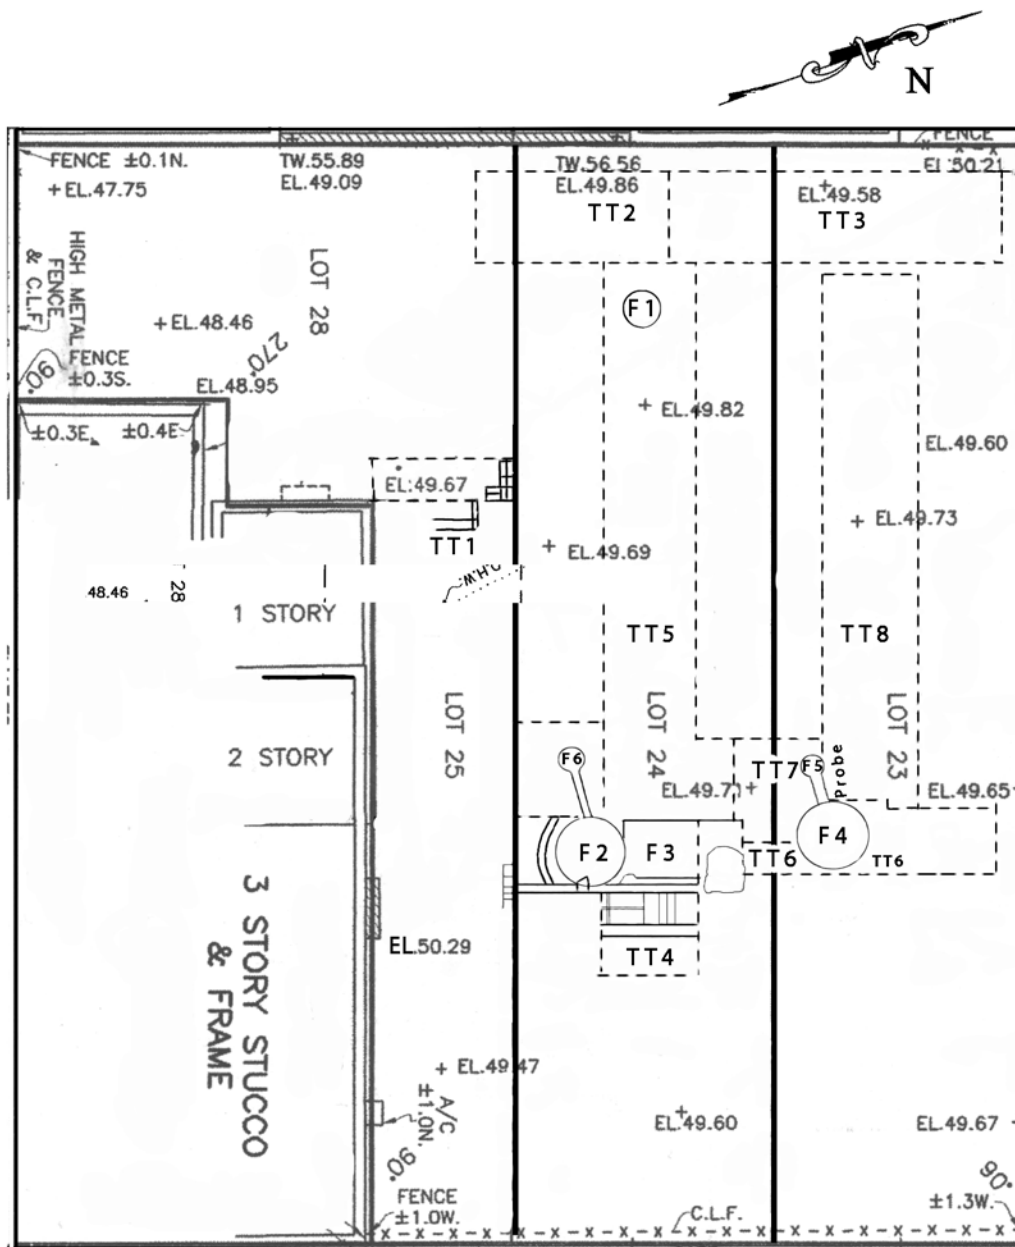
Plan of the project site showing the location of the test trenches and features (Base plan courtesy of Yuco Real Estate Company)
